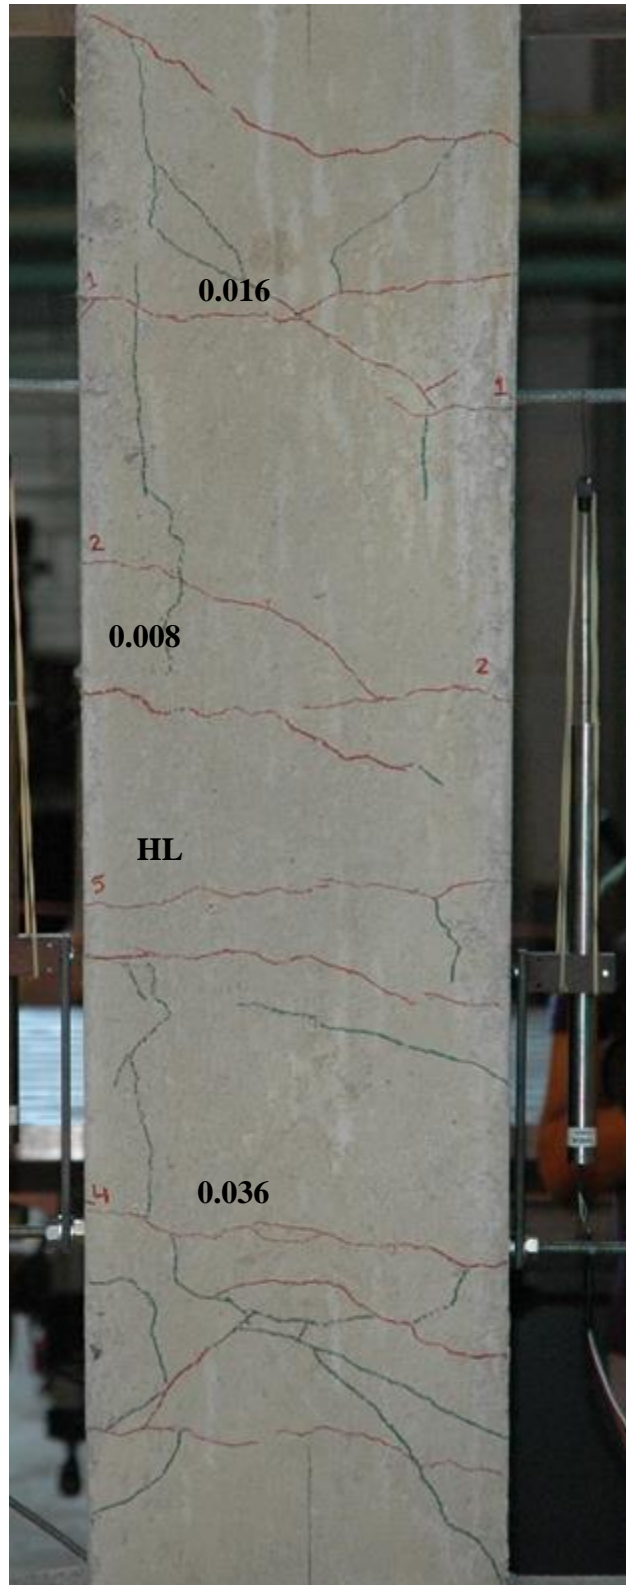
Cracks on west face of TS02 at Load Step 26
